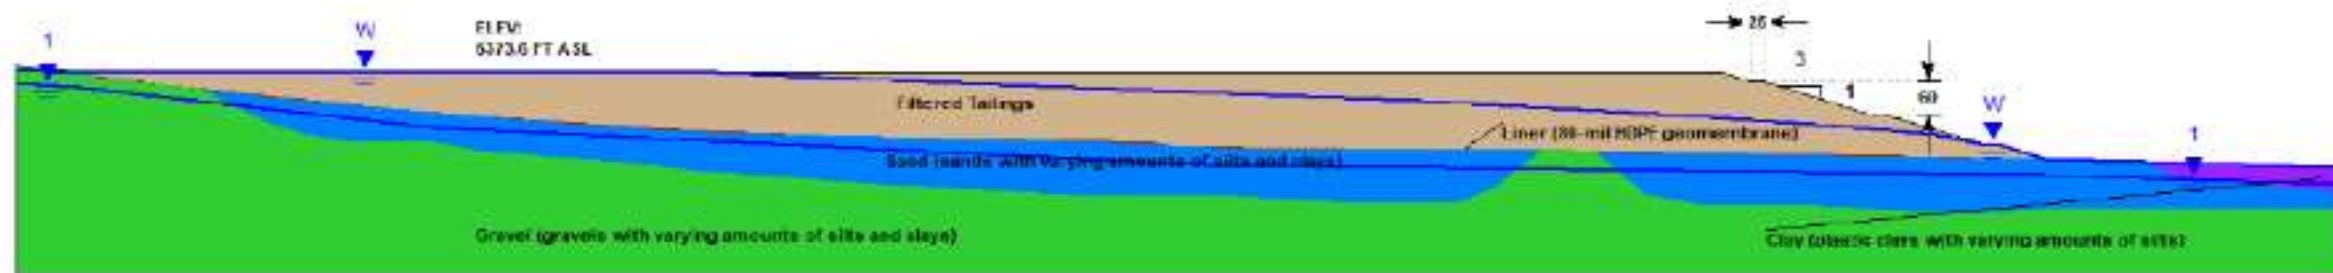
Plan Tailings Stacking-Stage 5 – Section E-E'
